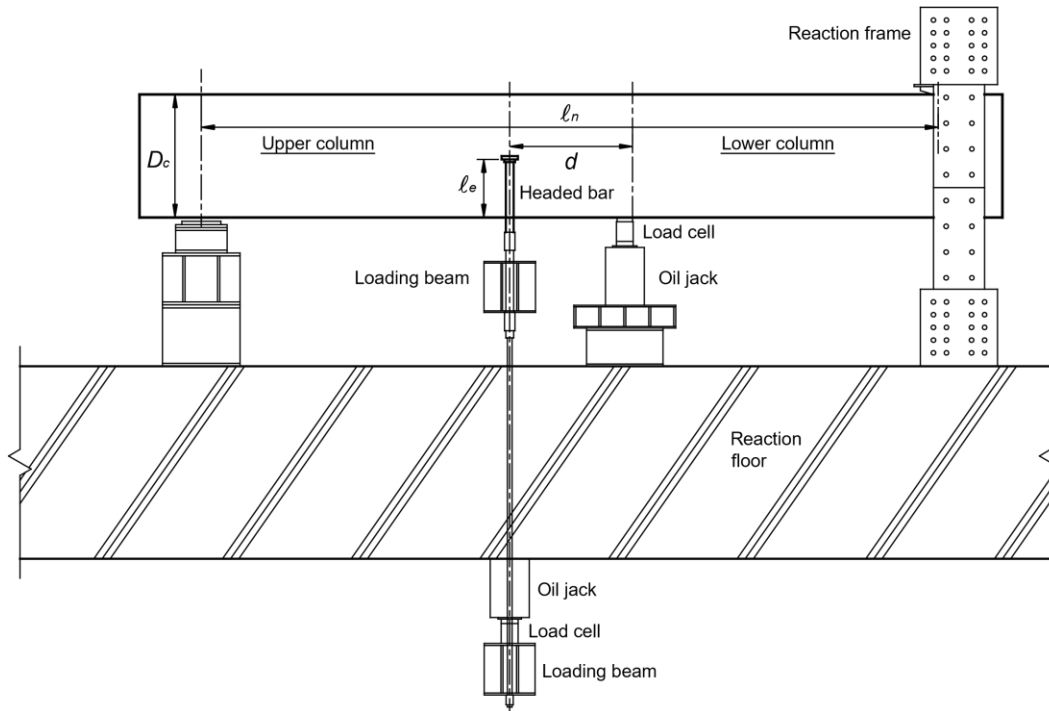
Test configuration for beam-column joints [figure after Chun et al. (2009)]
